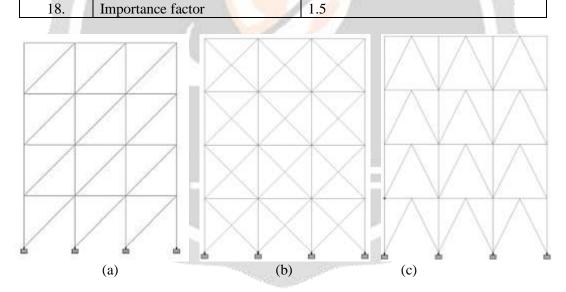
Modeling of OGS (a) strut structure, (b) cross braced structure and (c) chevron braced structure
